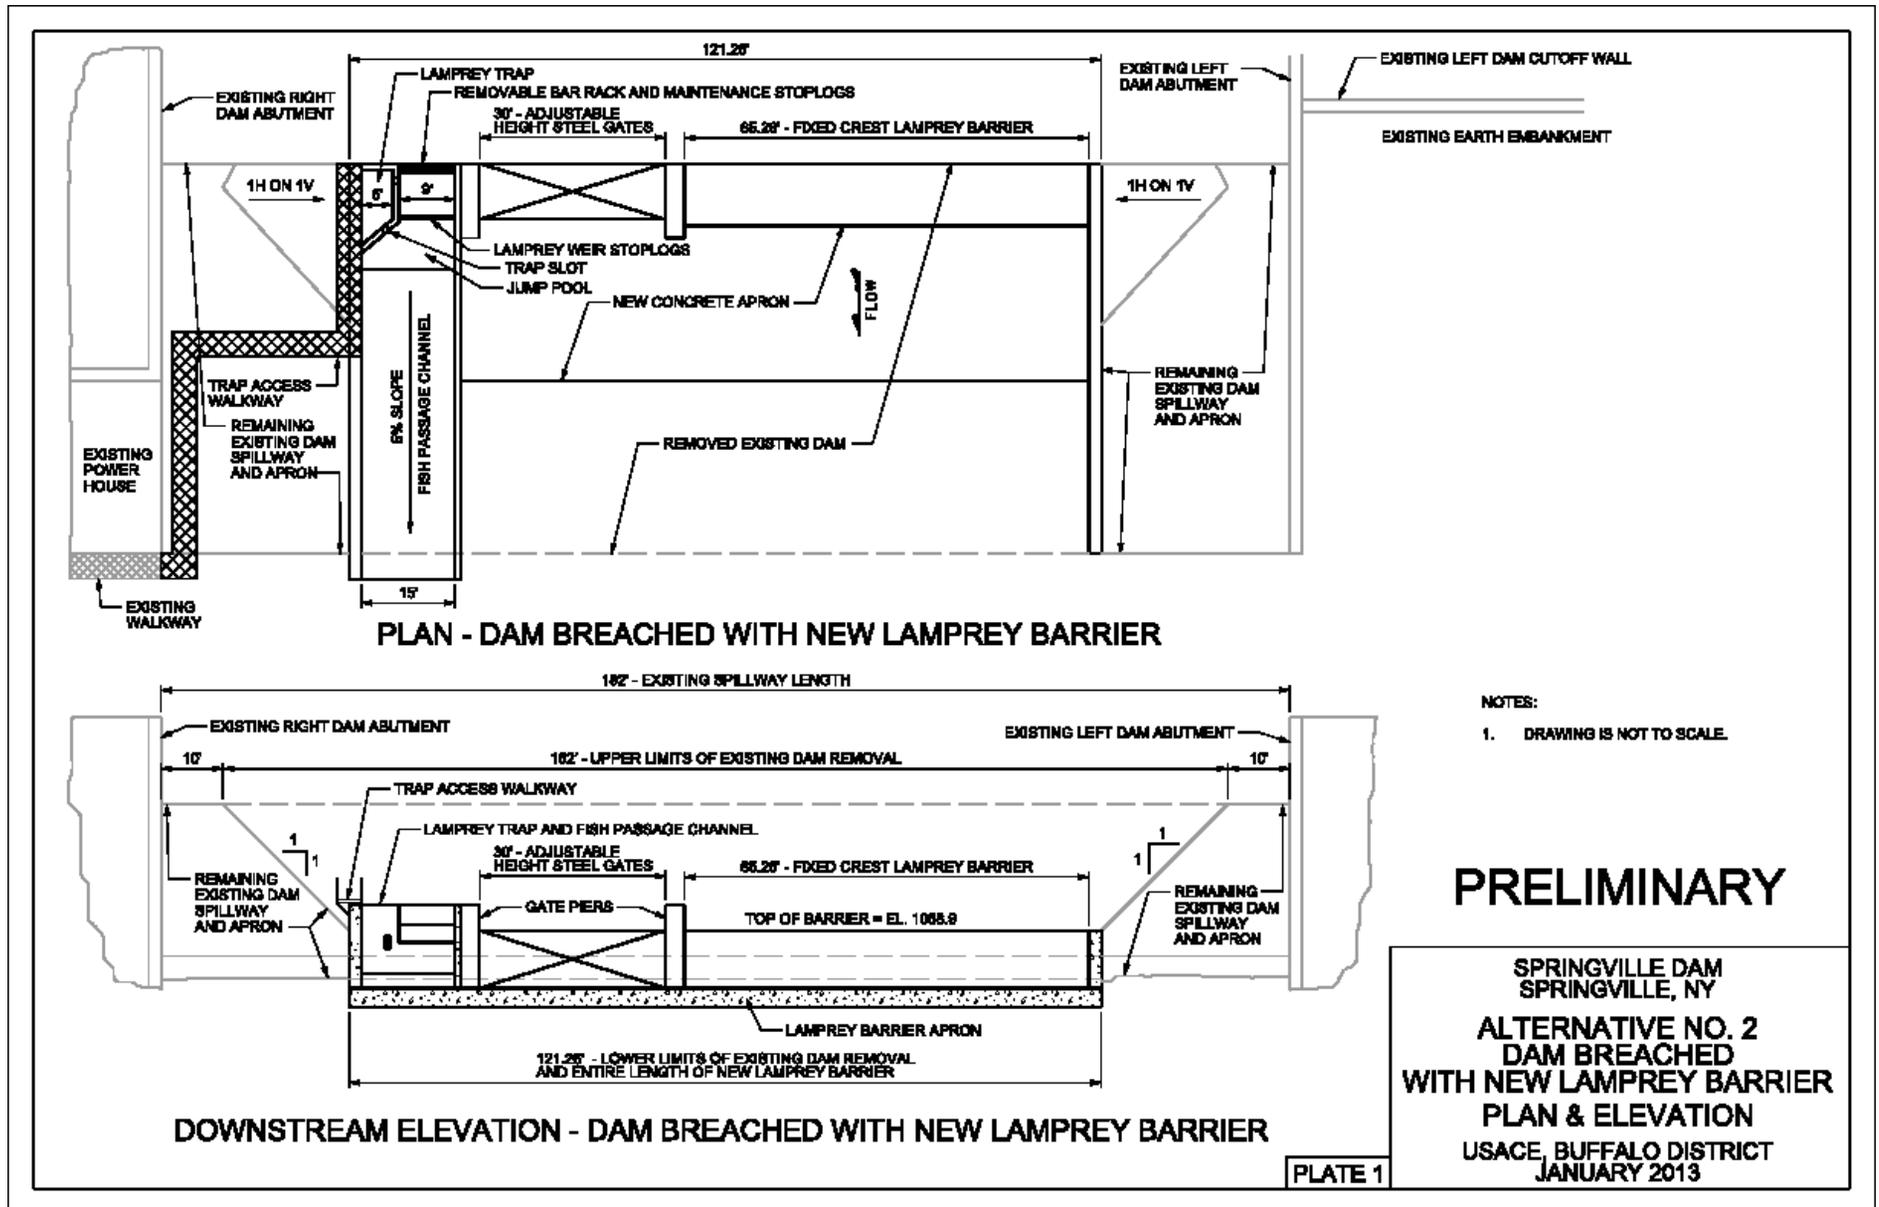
Plan view and elevation drawings for Alternative #2 - Dam breach with new lamprey barrier.
